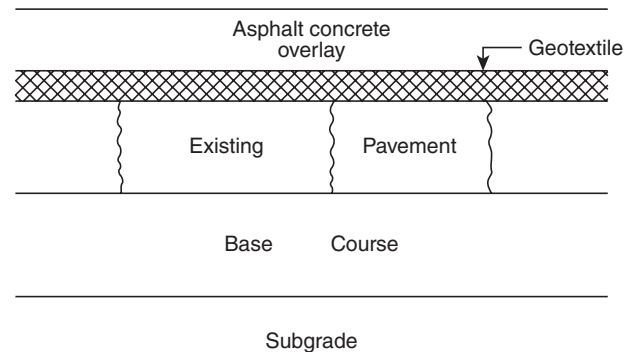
Geotextile for pavement rehabilitation. (TM 5-818-8)
